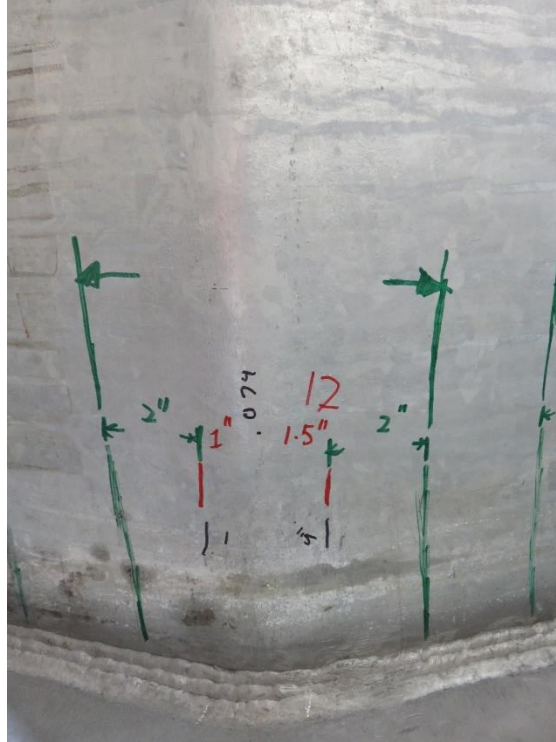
State of Cracks: Specimen 33-3-12-TX-A3 – Bend 12
